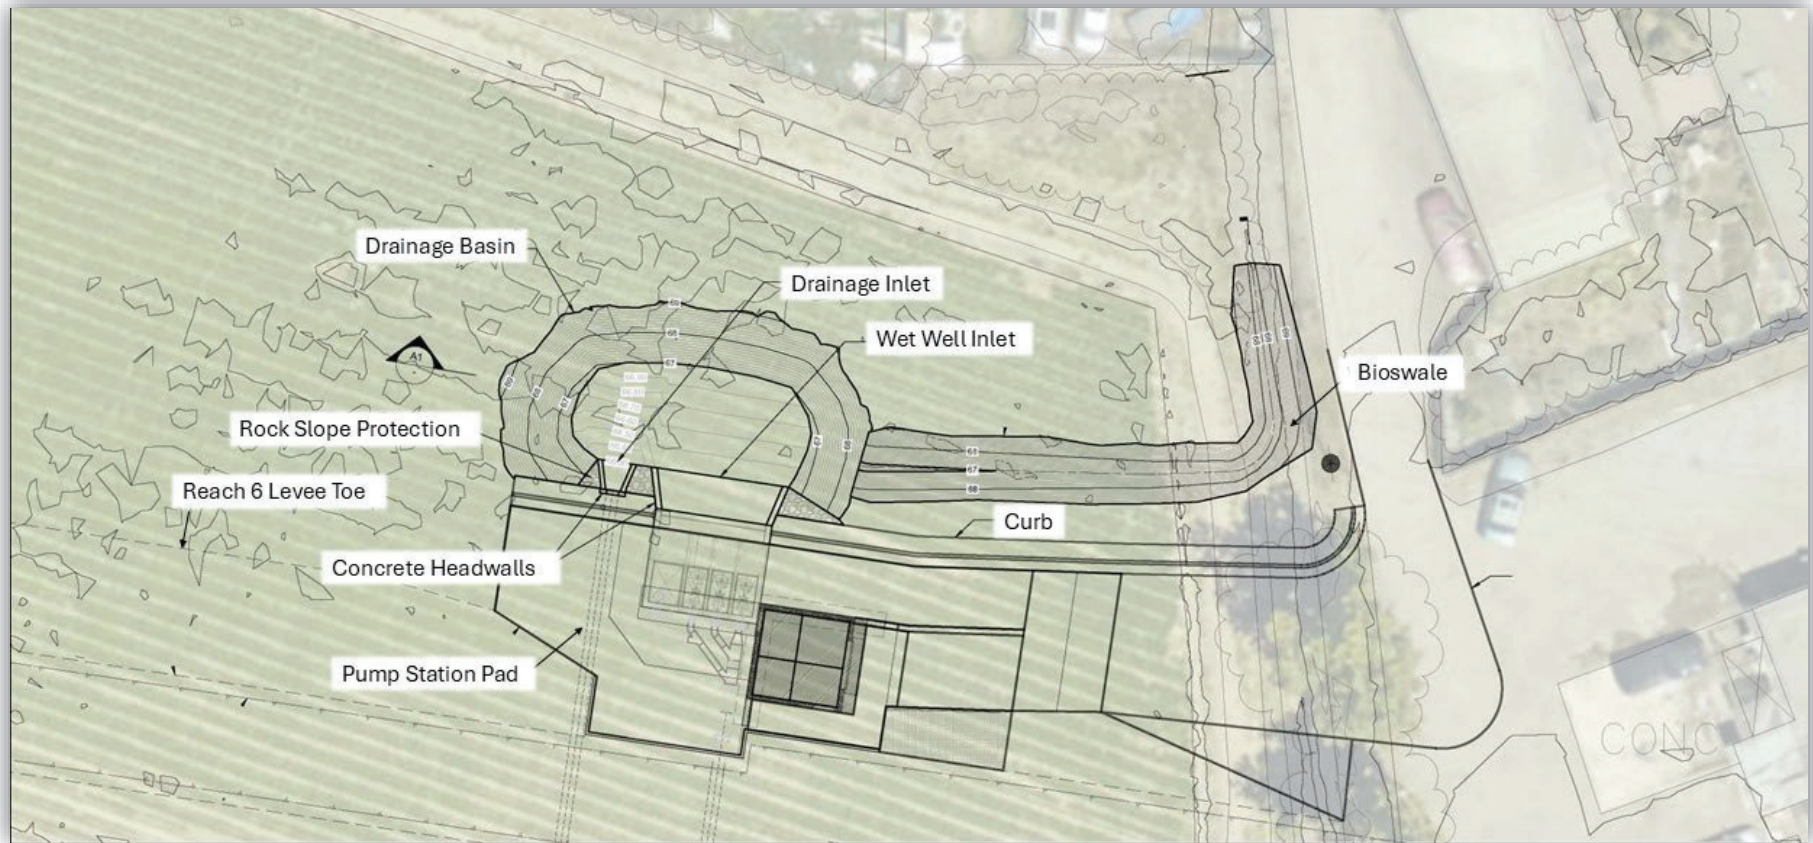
Plan set for proposed pump station layout. Bioswale feature will be at inlet to pump station pipes. In the bottom figure, Corralitos Creek is to the left of the page.
